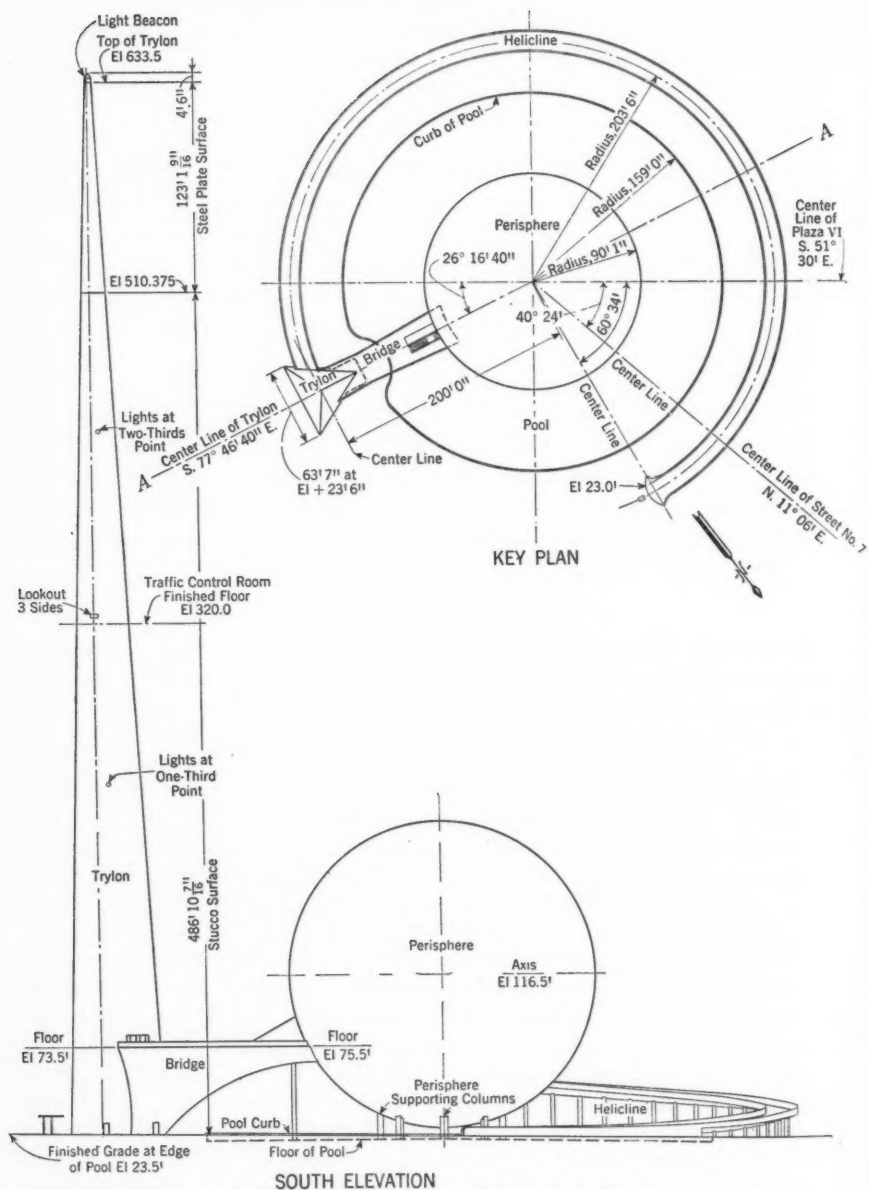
THEME BUILDING, NEW YORK WORLD'S FAIR
